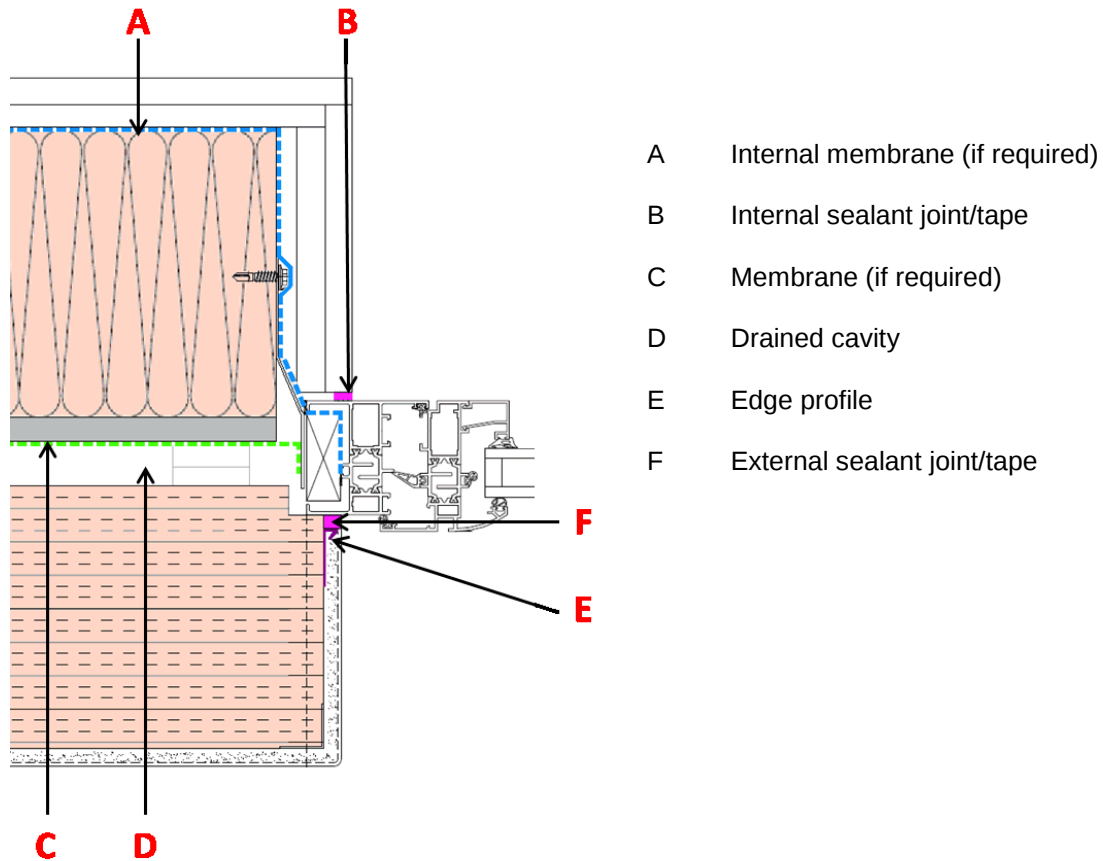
Window jamb interface with EWIS, framed back wall (insulated)
